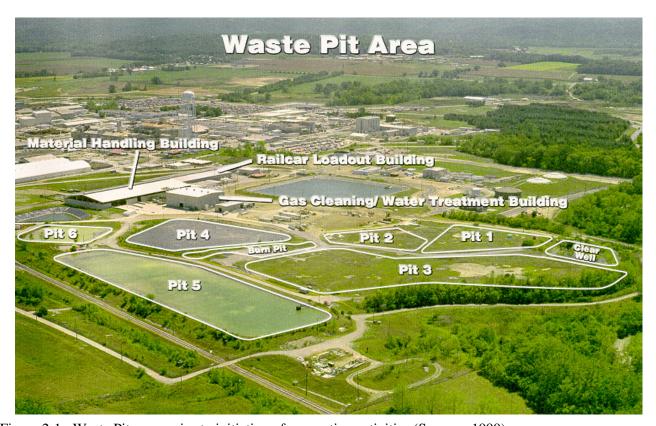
Waste Pits area prior to initiation of excavation activities (Summer 1999).
